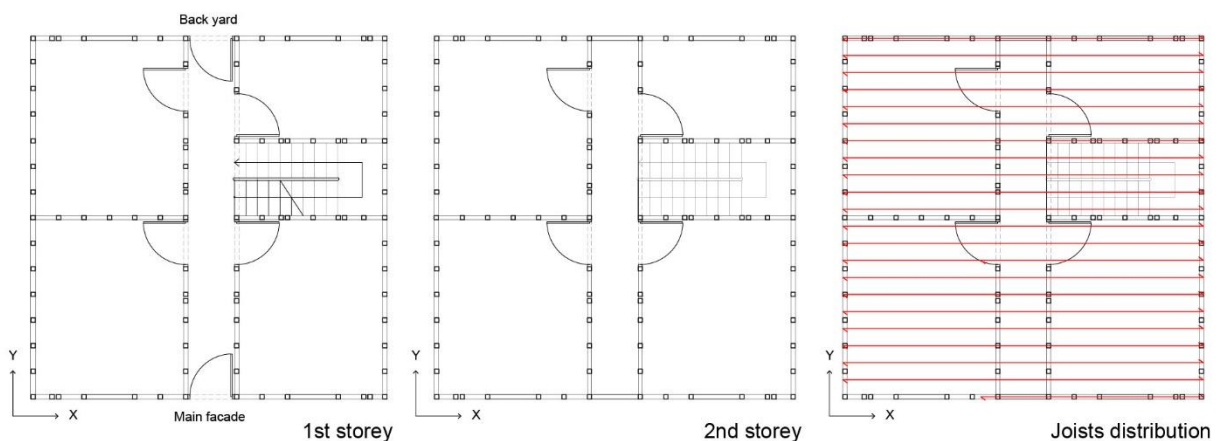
Typical structural unit of Valparaíso: plan layouts at different storeys.
